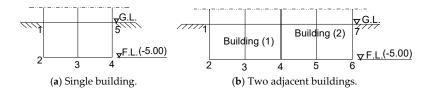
Points distributed around the foundations of the single and two adjacent buildings.
